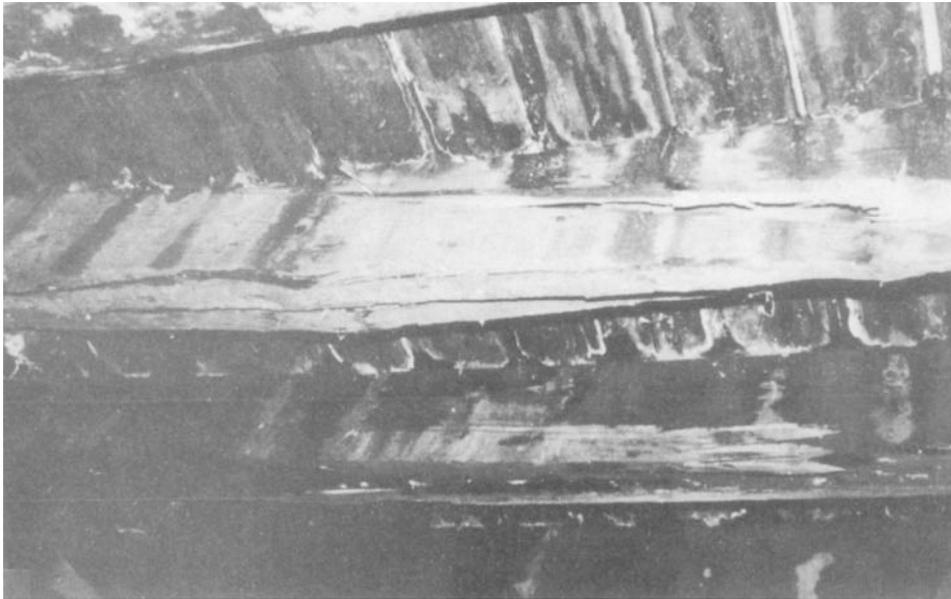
Longitudinal cracks in timber beam due to overload.
